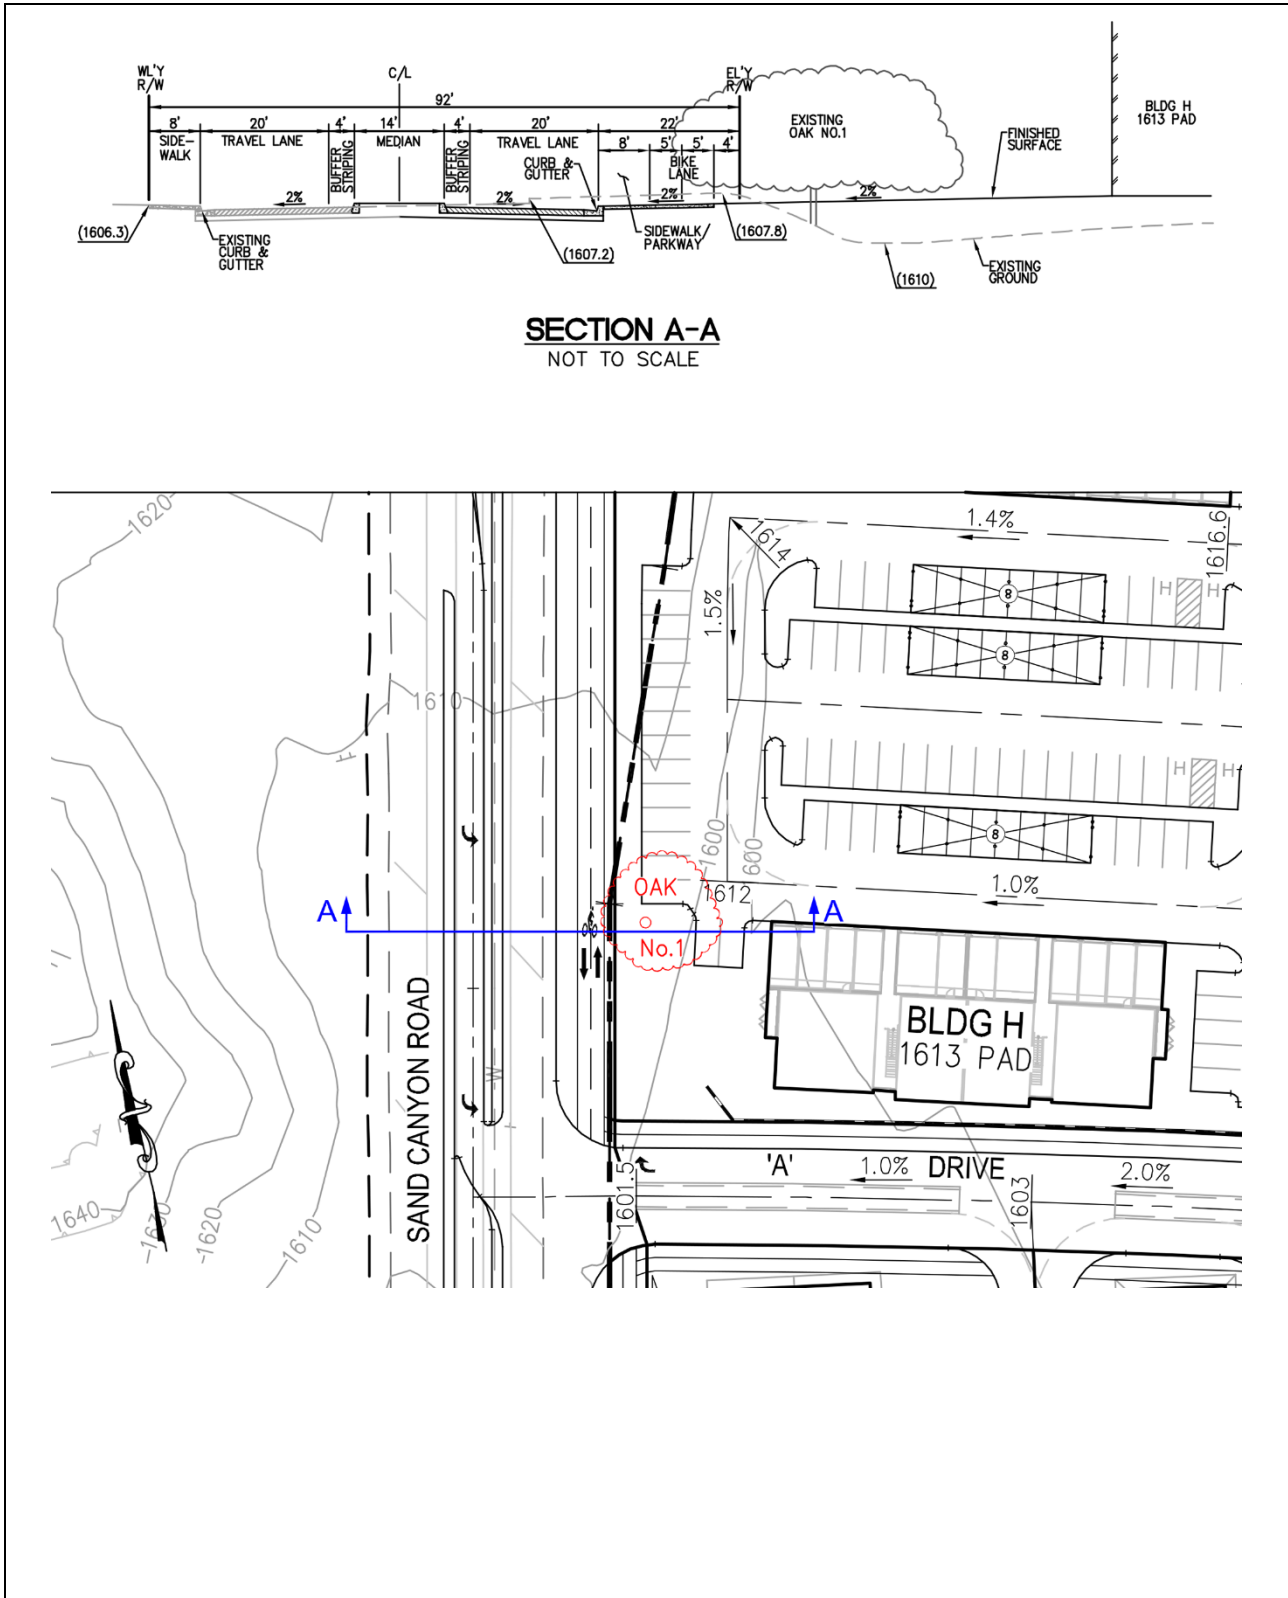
Oak Tree No. 1 Cross-Section
